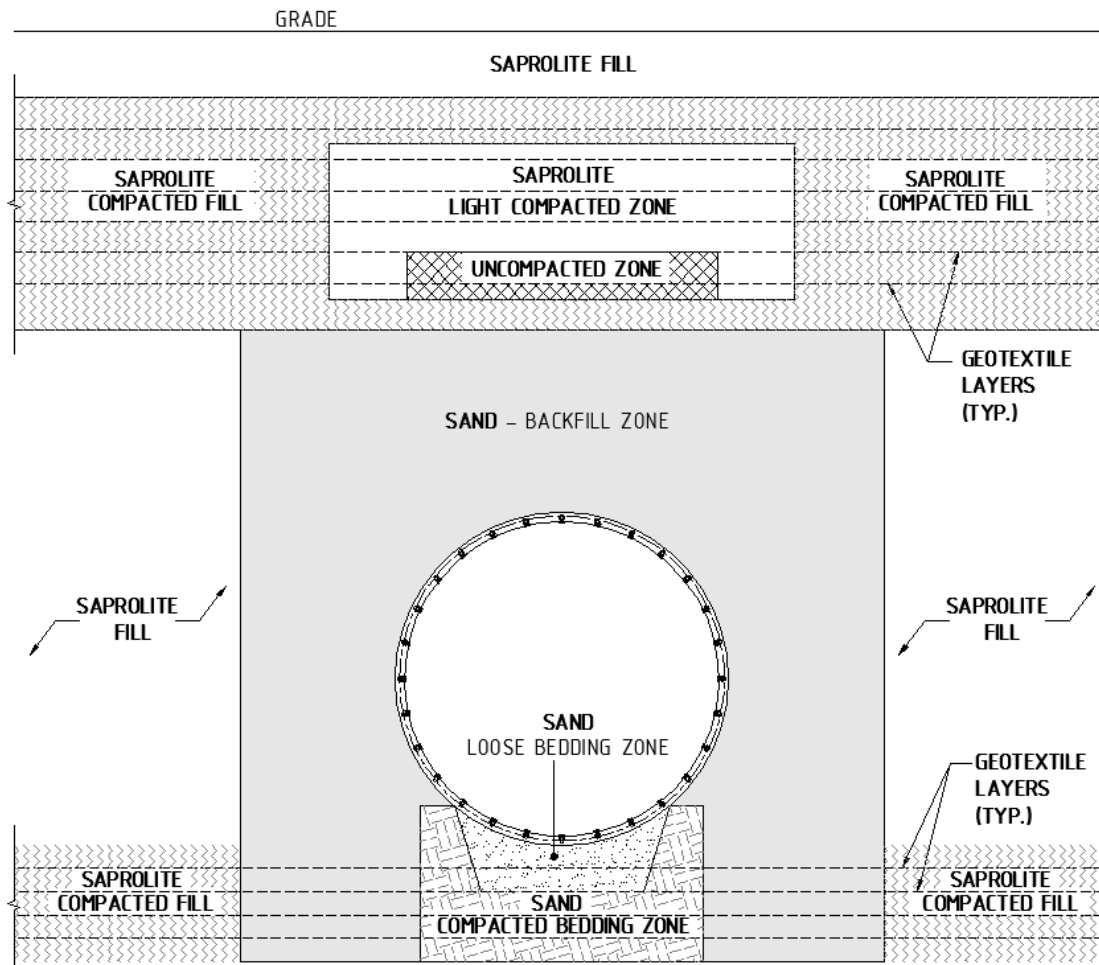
Cross section view with backfill zones at mid-section of culvert.
